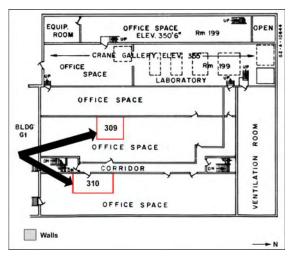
G2 357-Foot Level, Rooms 309 and 310
